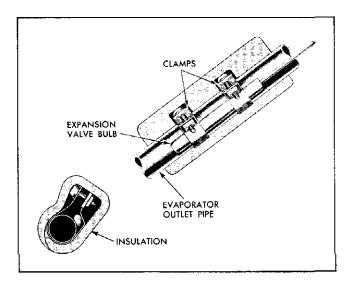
Thermostatic Expansion Valve Bulb at Evaporator Outlet Pipe
